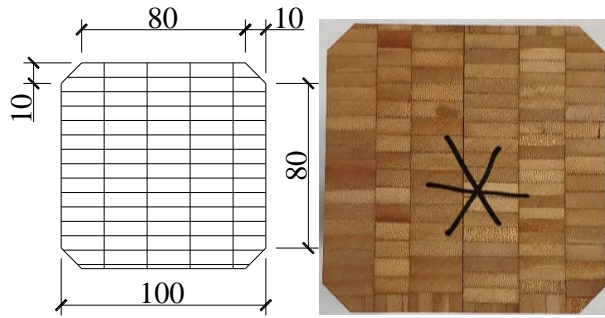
Arrangement of bamboo strips and cross section of laminated bamboo column
